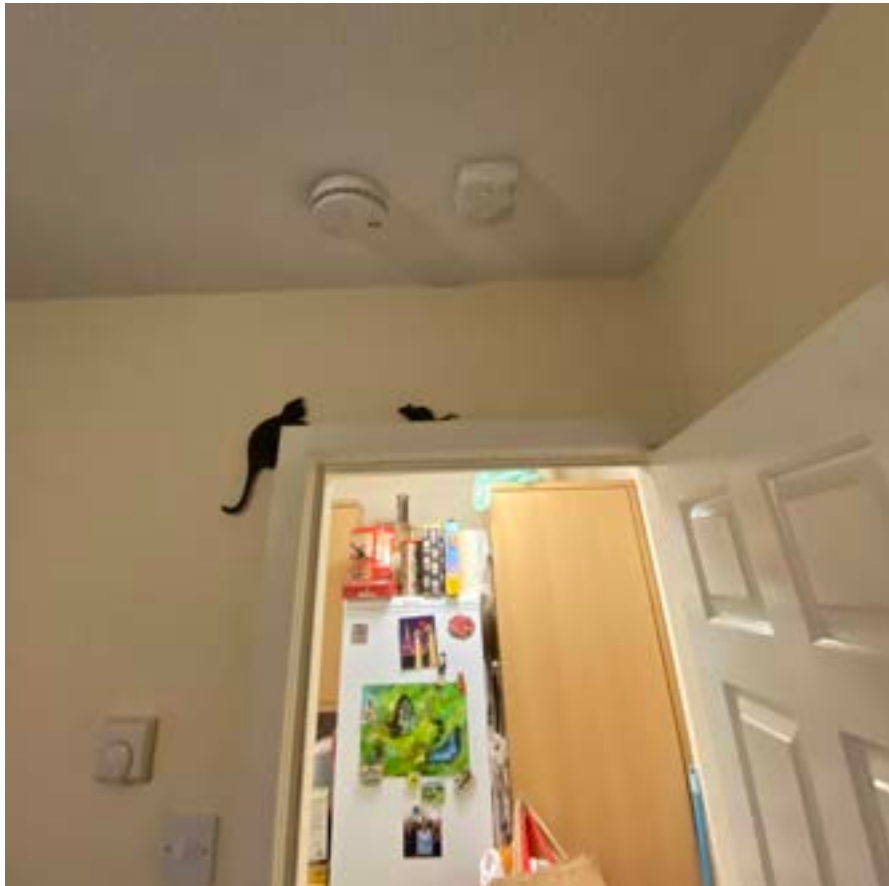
showing typical modern door, absence of coving cornice, dado and picture rails
